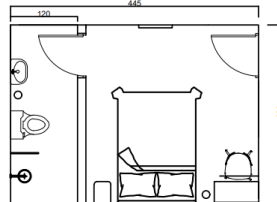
Layout sketch of Double Room (Askia, 2023)
